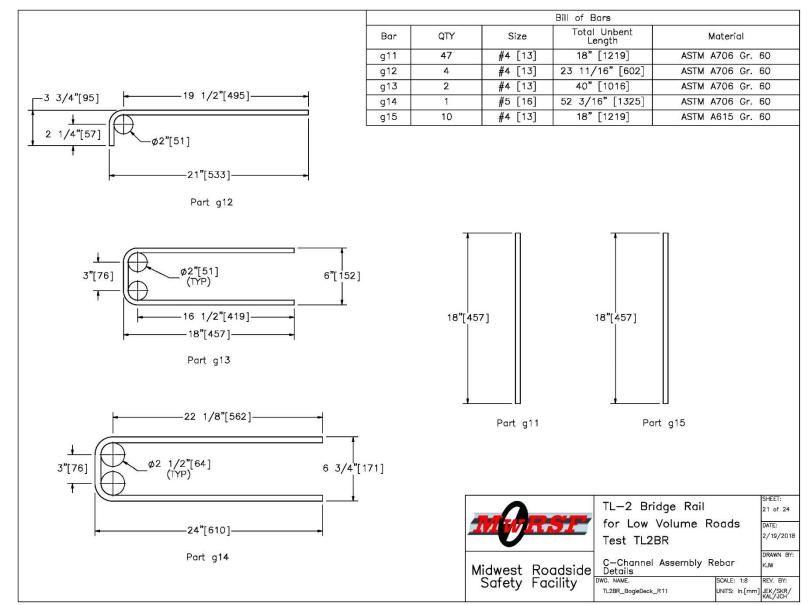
Bogie Testing Matrix and Setup, C-Channel Assembly Rebar Details
